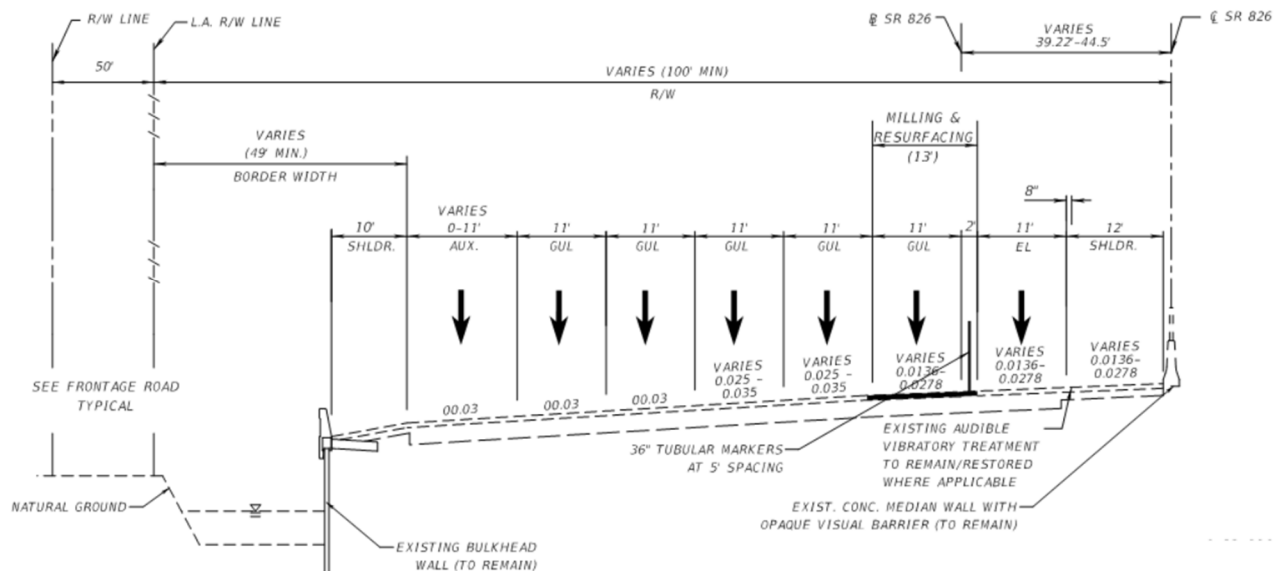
| Typical Section: SR 826 Southbound Two Express Lanes
